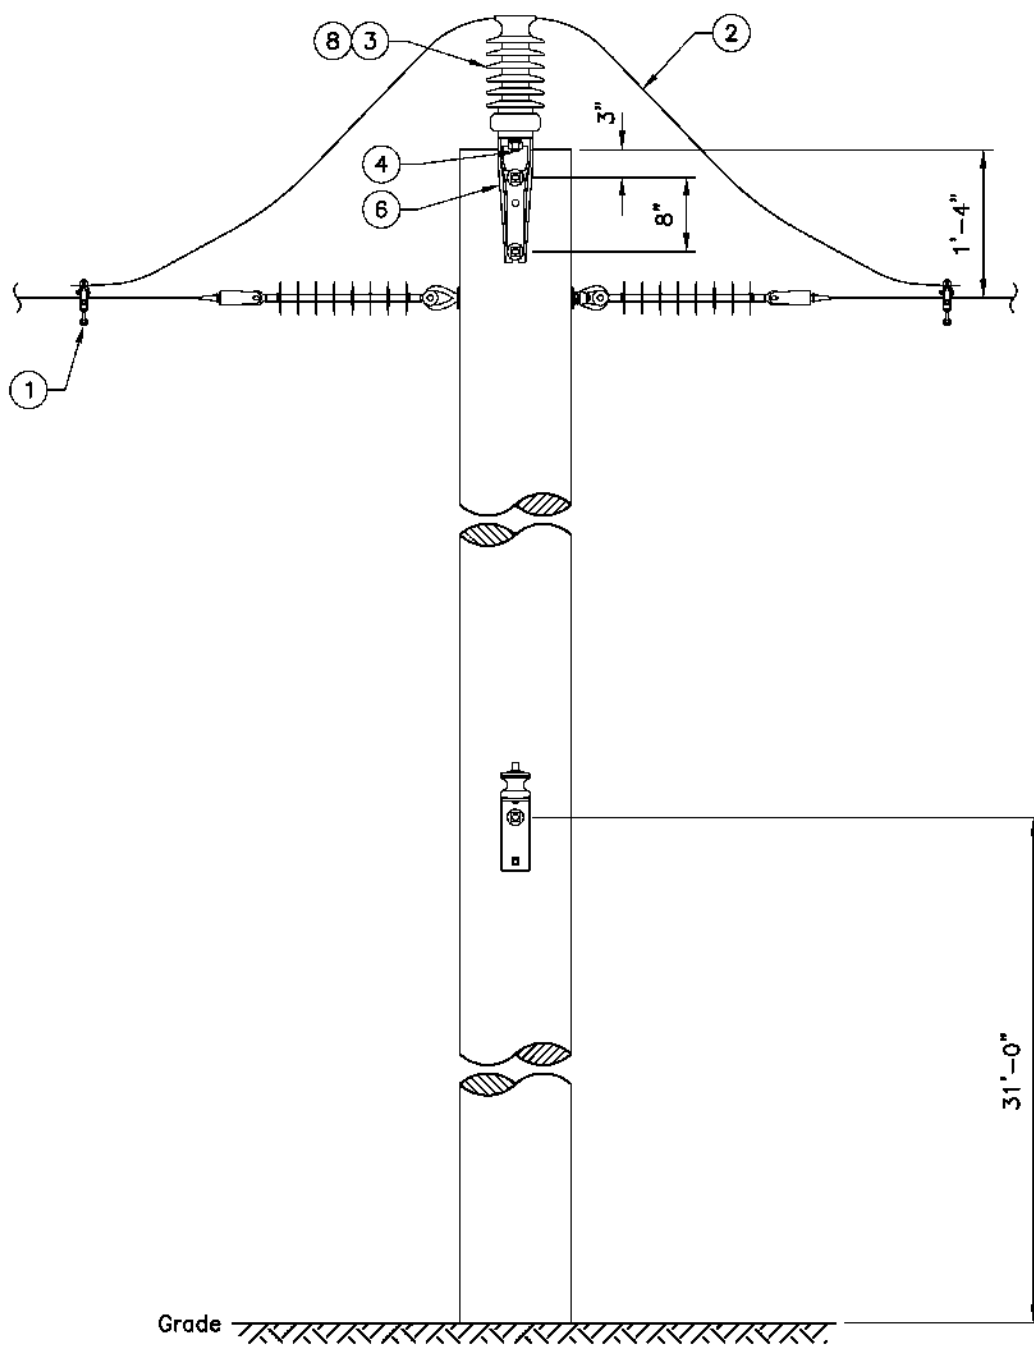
Single-Phase Double Deadend 60°–180° Crossarm Jumper, Side View
